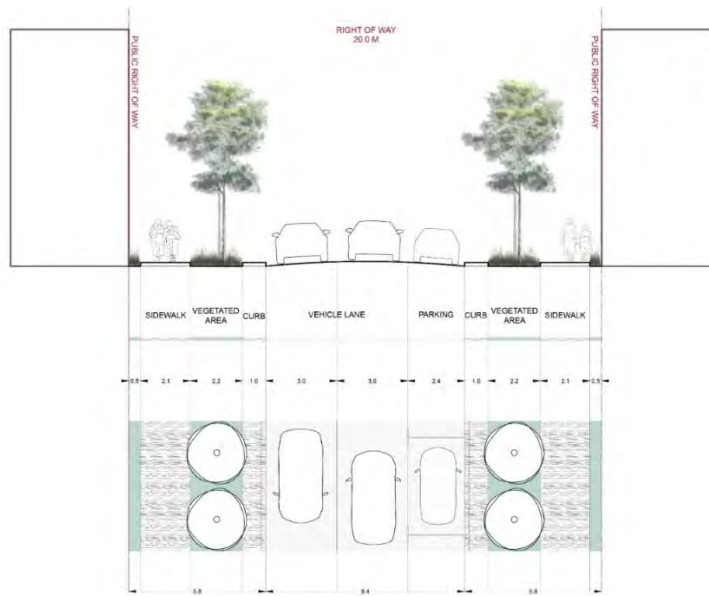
Existing Local Employment Complete Street Cross-Section
